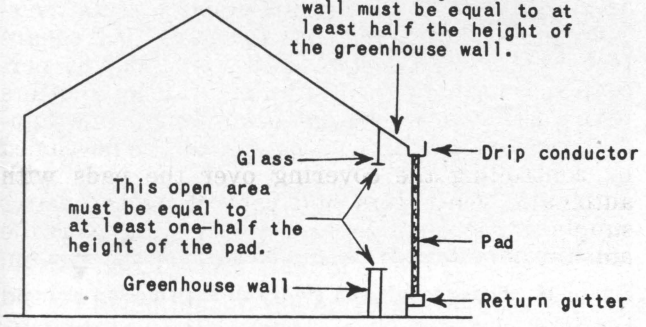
Installation showing pad system constructed outside the greenhouse wall.
